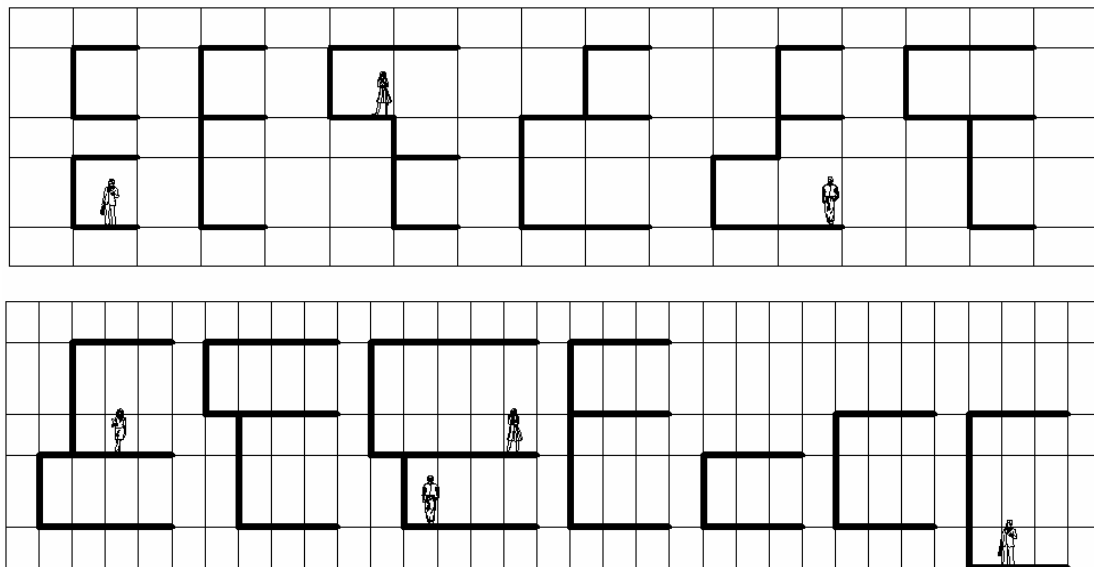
Some Possible Sectional Arrangements (parallel and perpendicular to truss)
